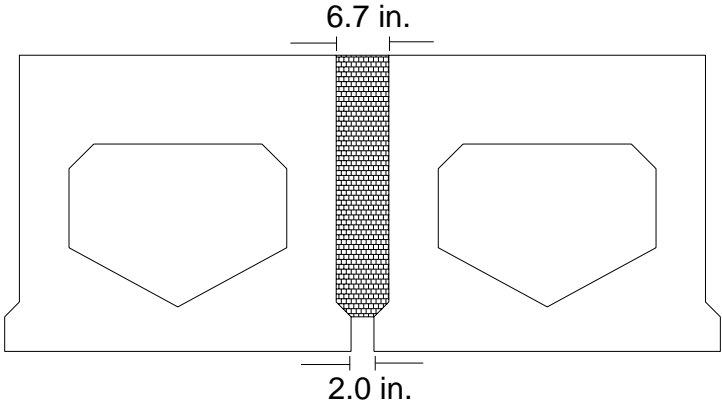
Typical geometry for box-beam grouted shear key used in the U.S.
